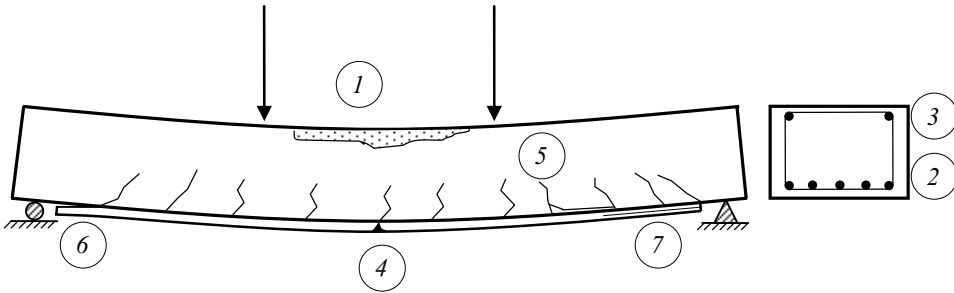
Possible failure modes for a reinforced concrete beam strengthened with the MBC system.
